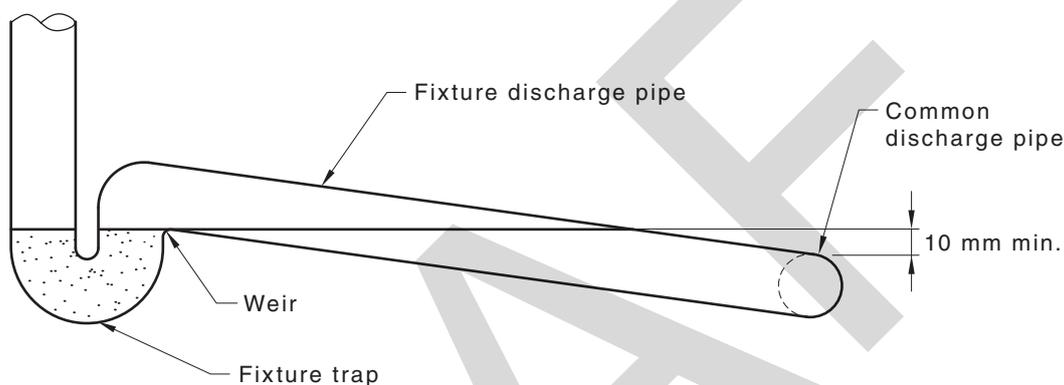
TYPICAL CONNECTION OF FIXTURE DISCHARGE PIPE TO A COMMON DISCHARGE PIPE
